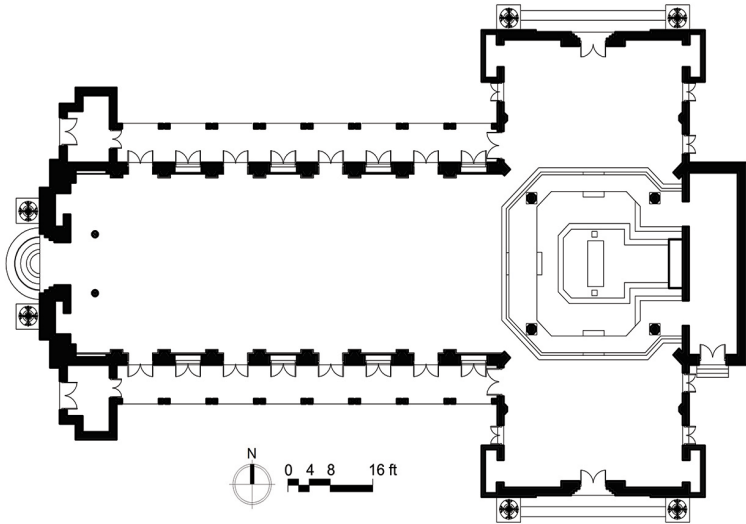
Ground floor plan of St. Philip Neri's church, Kalutara
